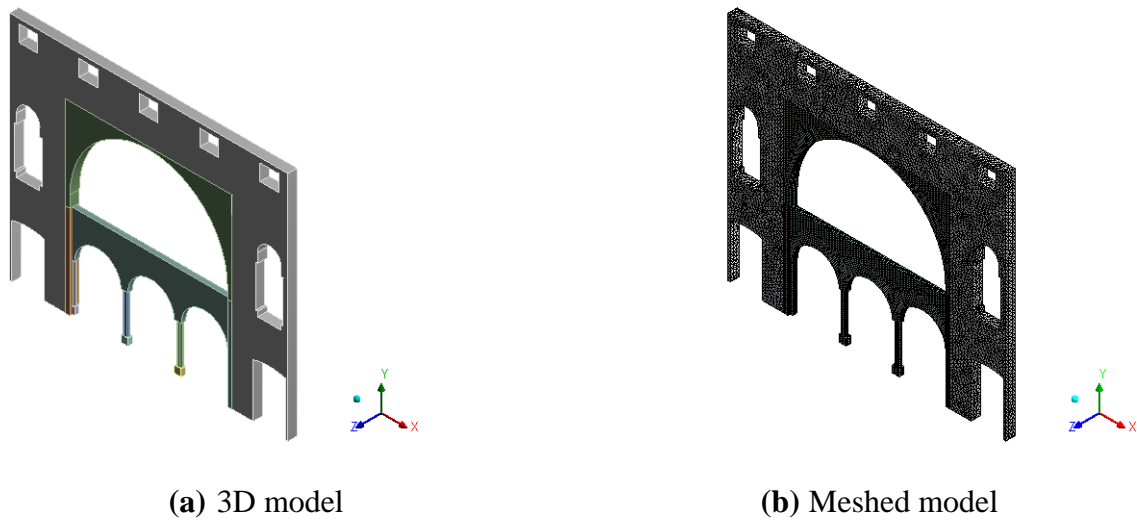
Finite element model of Internal Masonry wall (Indo-Saracenic Style).
